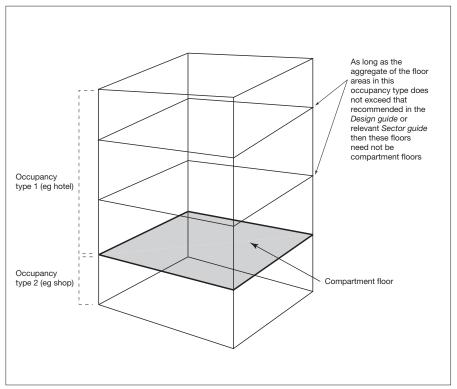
Compartment floor between different occupancy types (note: fire can spread from floor to floor via unprotected shafts)
